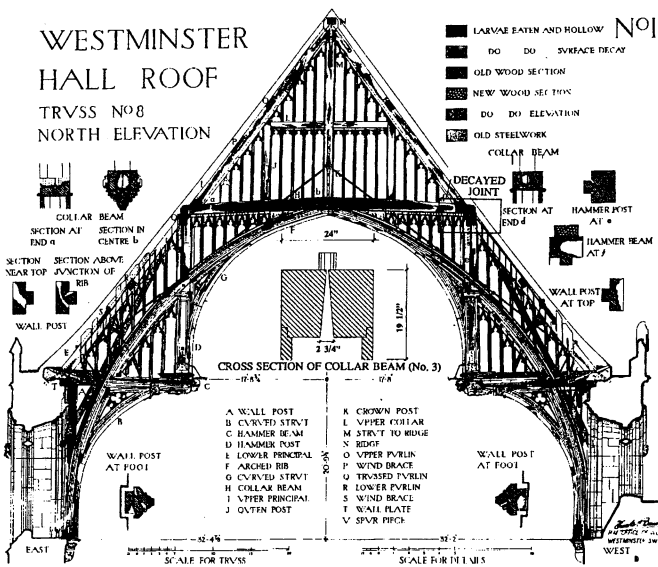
Westminster Hall. Elevation of truss framing (drawing published in Baines' Report, 1914, Plate 3).
